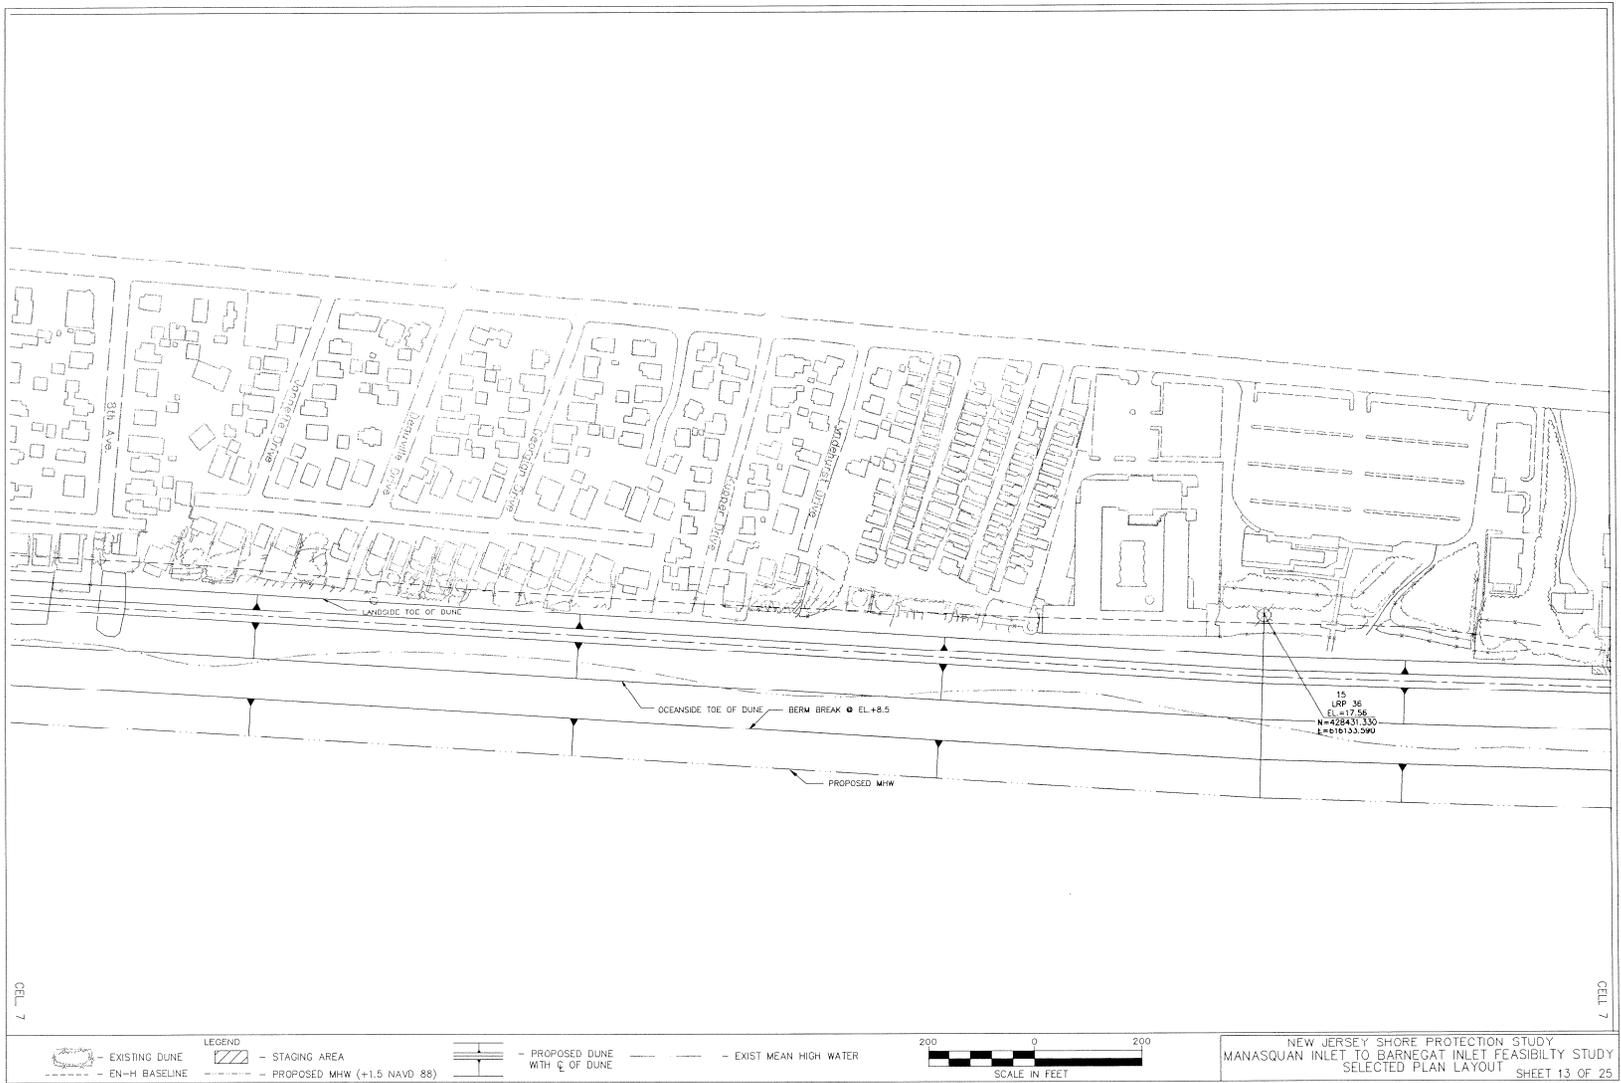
Selected Plan Layout – Brick Township, Normandy Beach to Mantoloking Estates
